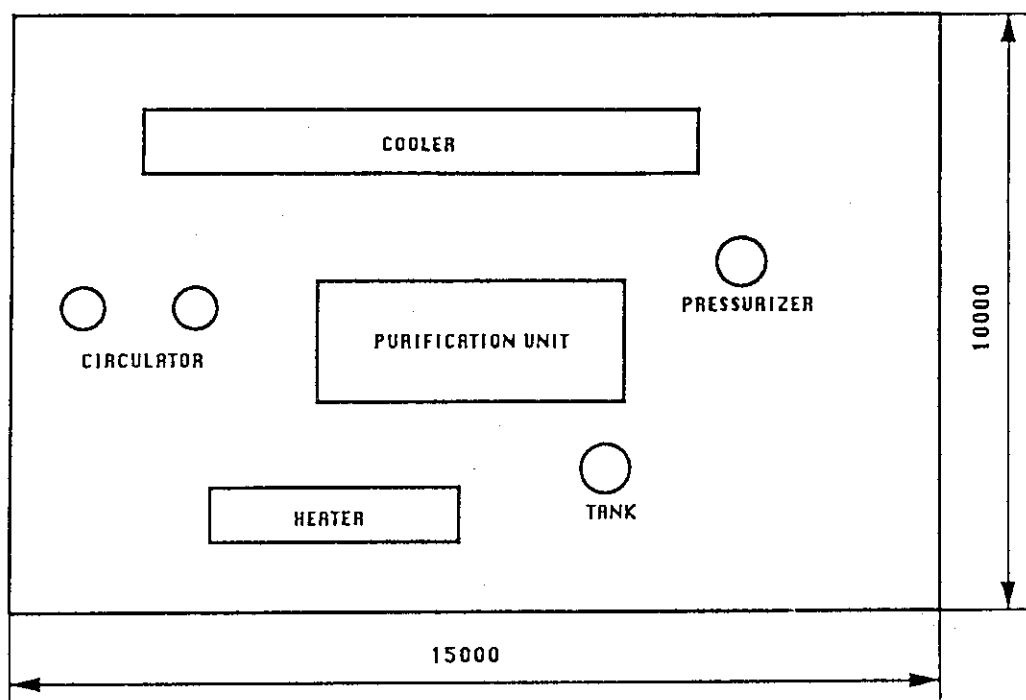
Layout plan of cooling system for water-cooled test module
